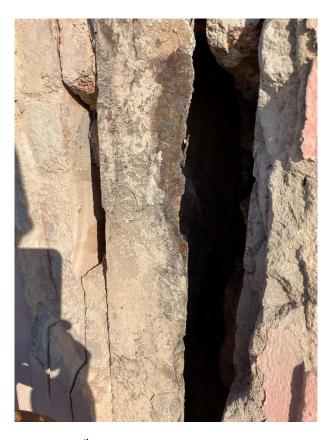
Quay Street Column at 4<sup>th</sup> floor level. Severe section loss of columns evident.
